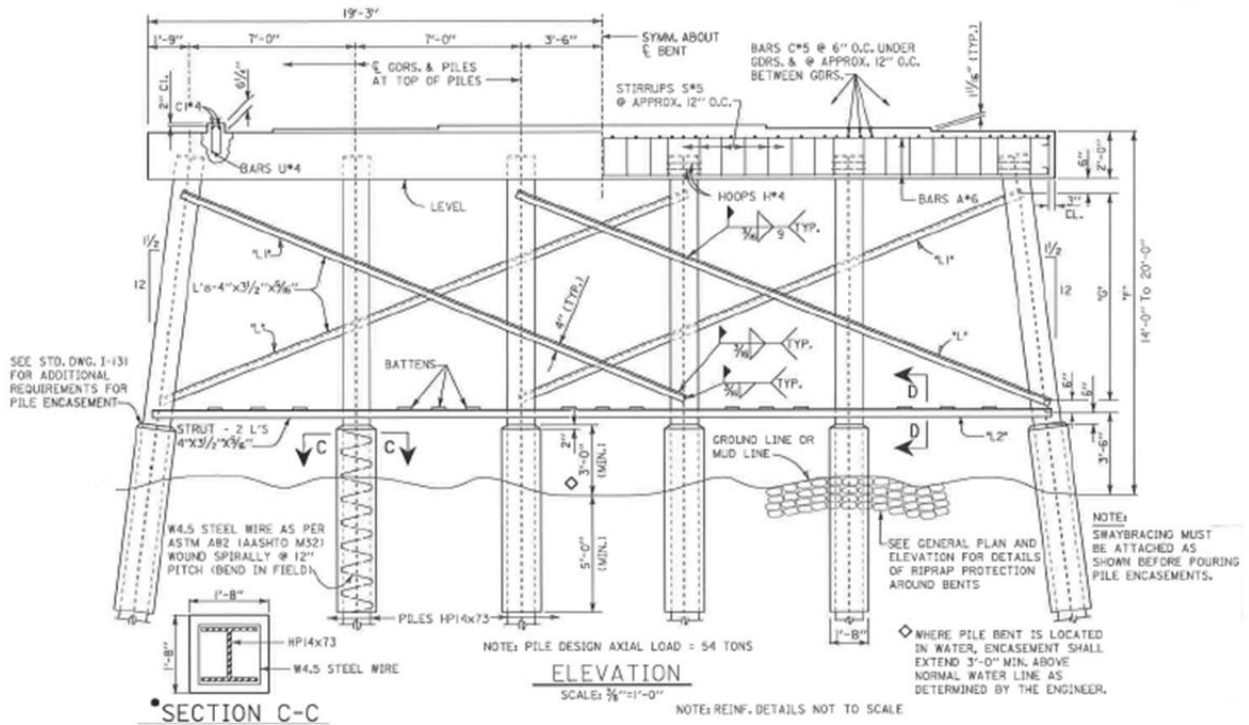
Typical Pile Bent Substructure with One-Story Sway Bracing
